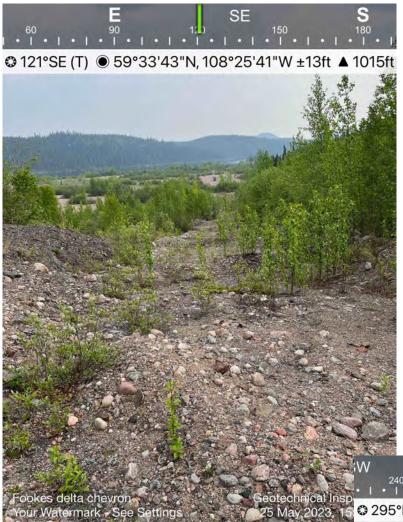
Chevrons in place on north access point to the Fookes delta looking south (May 2023)
